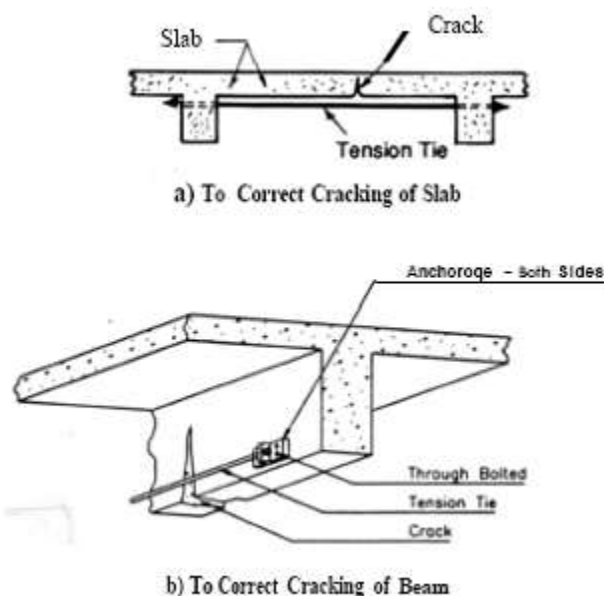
METHOD TO CORRECT CRACKING SLAB AND BEAM
